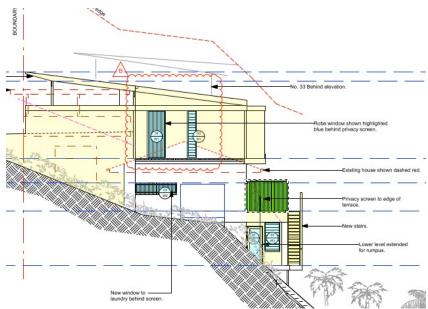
Proposed western elevation. Privacy screen of concern in relation to views highlighted in green. Location of existing dwelling dotted red.
